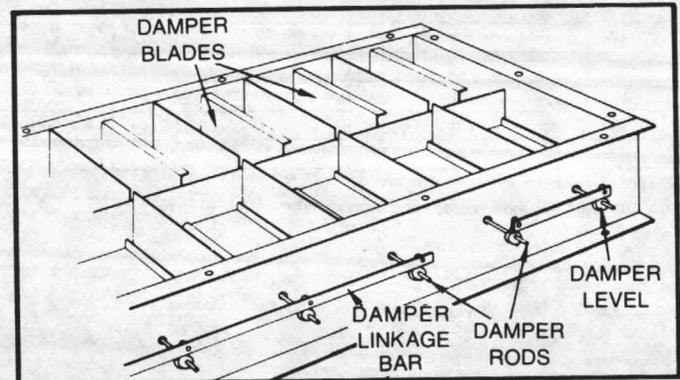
A - Setting the Zone Damper Rods and Damper Linkage
